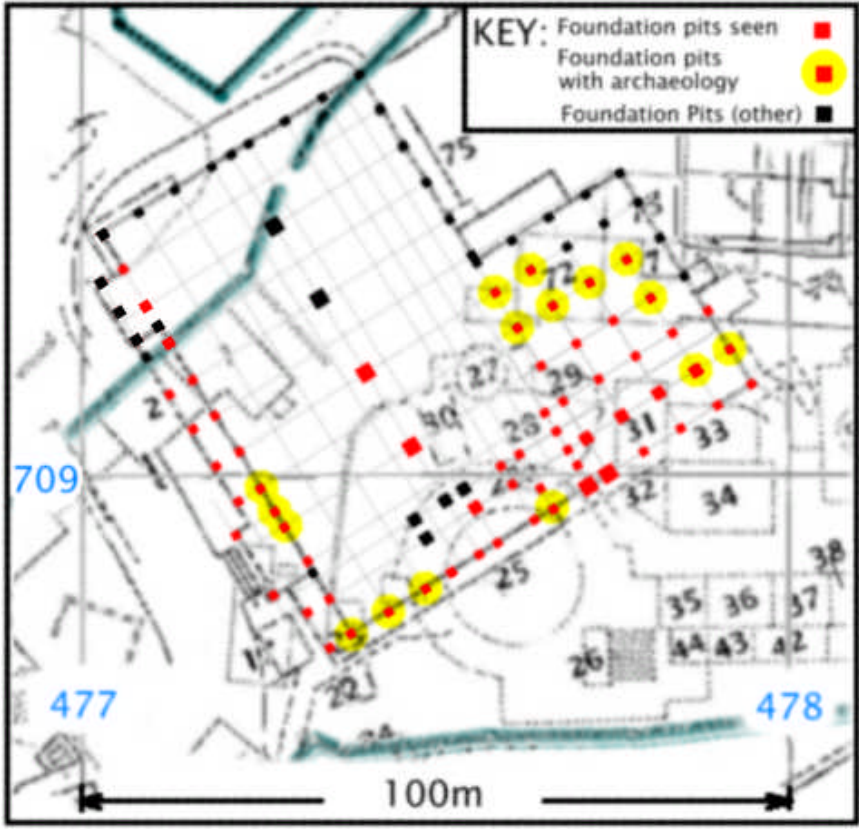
Superstore foundation pit plan superimposed on 1870 plan
